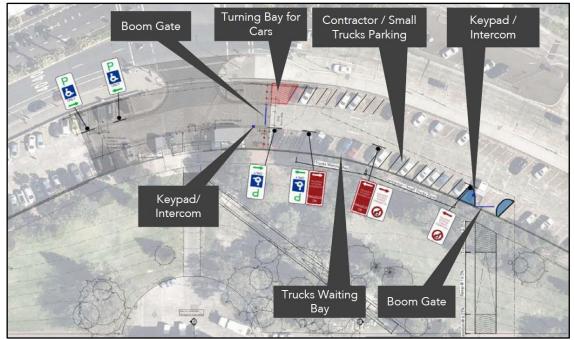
Proposed Servicing Arrangement (Source: PTC)
